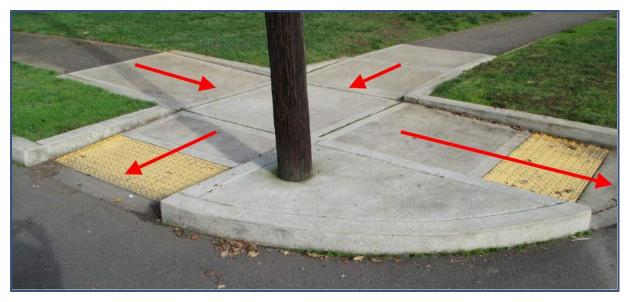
Four Ramp Runs on One Curb Ramp System
